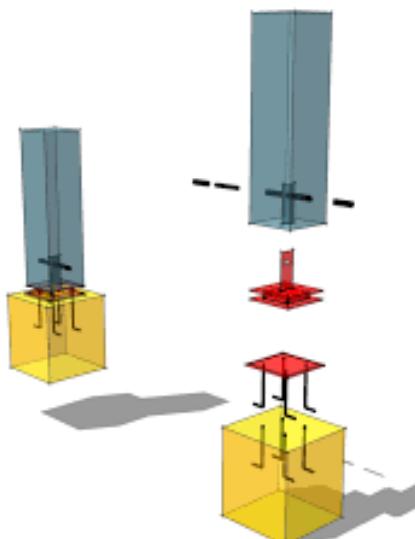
Example of the way for the continuation of the existing concrete structure in case of lack of lap reinforcement, image source: <https://www.quora.com/How-do-you-extend-a-new-reinforced-concrete-column-onto-an-existing-concrete-floor> [accessed 10th of May]
